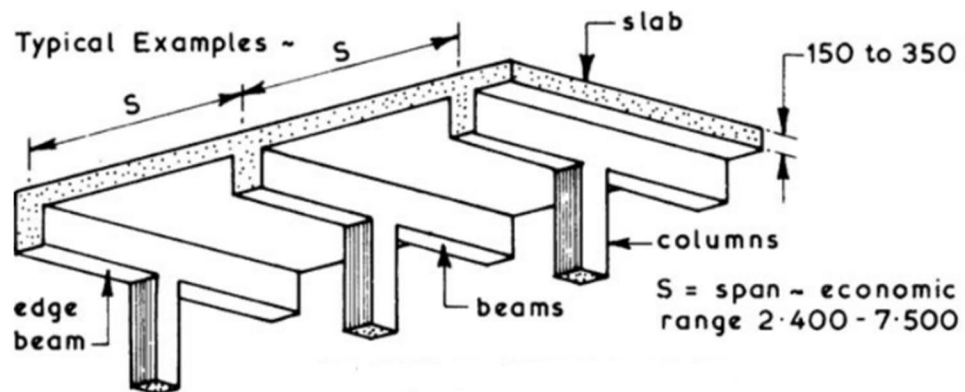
One-way beam slab with beams (Chudley & Greeno, 2014, p. 784)
